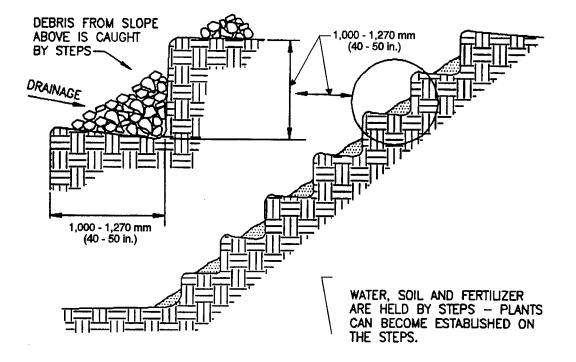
STAIR STEPPING CUT SLOPES
